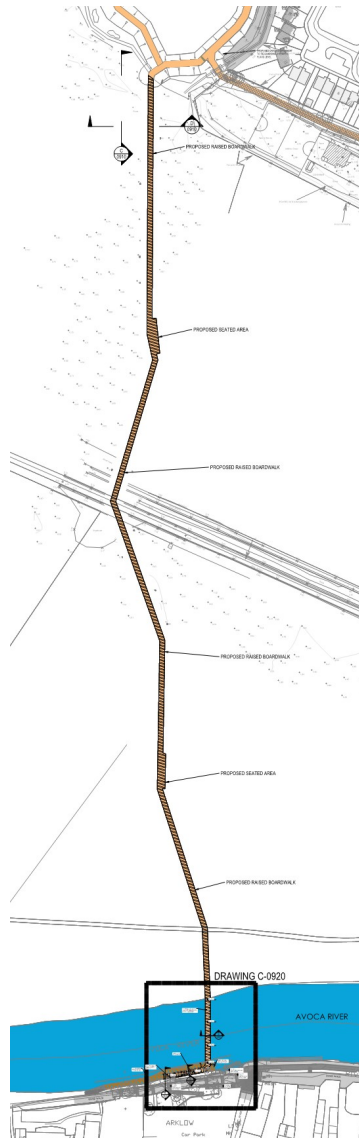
Extract from DOBA Engineering drawing C-0900 illustrating the Proposed Boardwalk Alignment traversing Southern Marsh.
